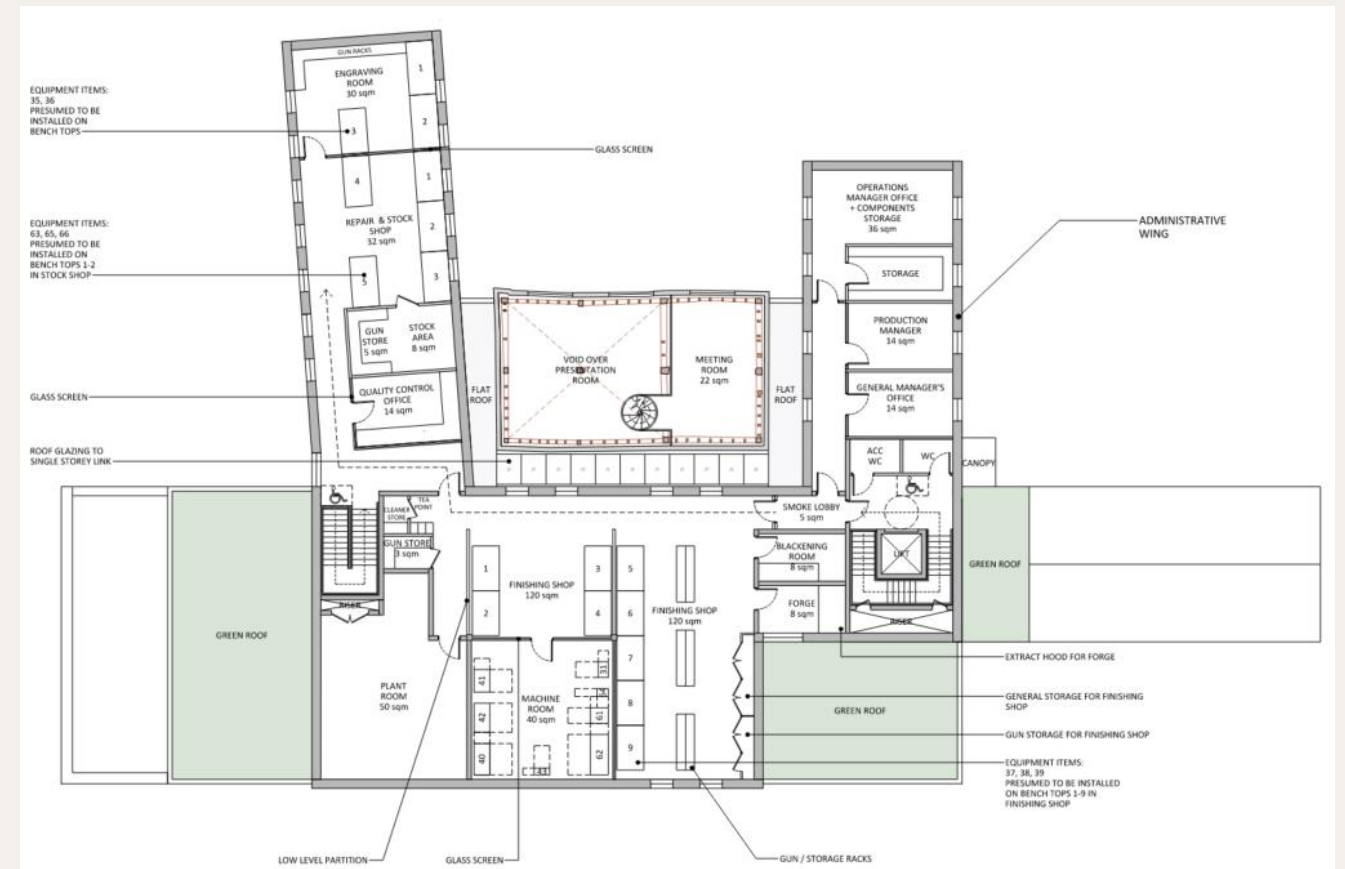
Proposed First Floor Plan (Source: McDonald Architects)
